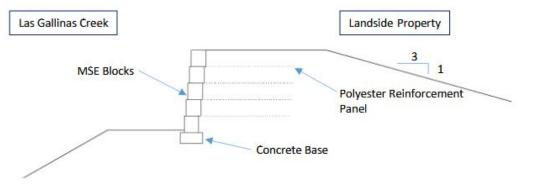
Mechanically Stabilized Earth Wall Cross Section
